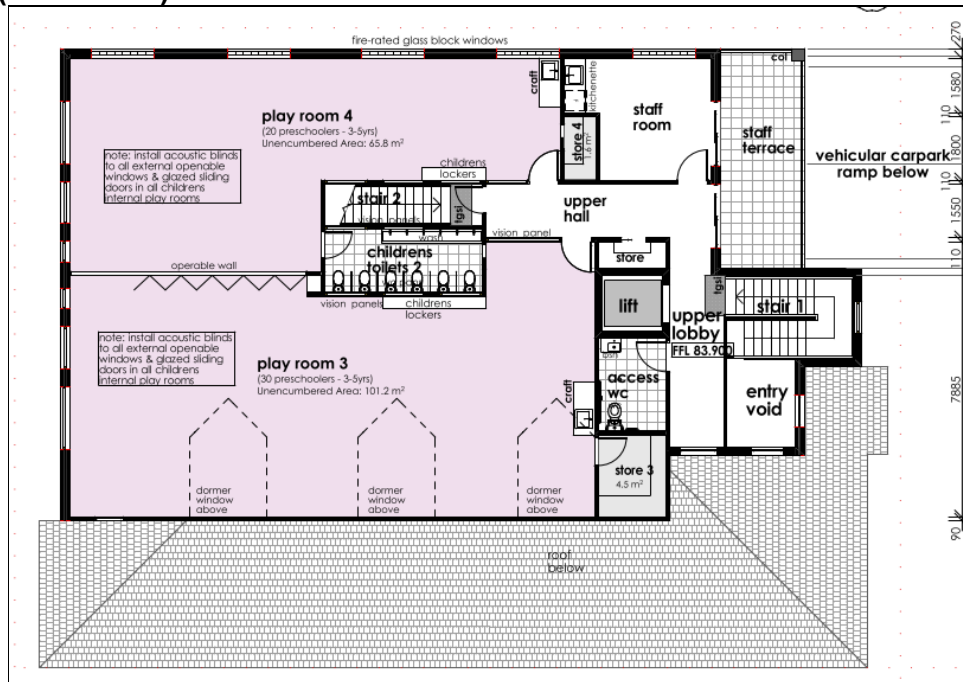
Extract of proposed first floor plan Source: Archizen Architects Issue D dated 08-02-2021
